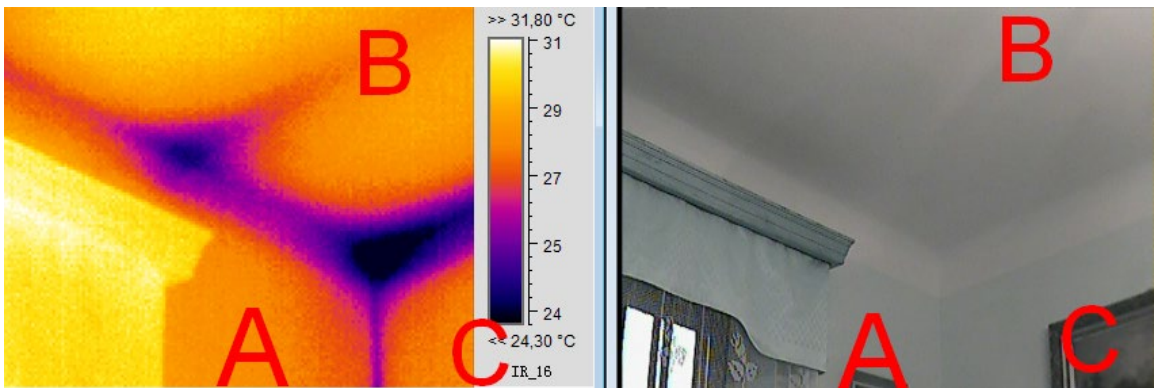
Place of joint wall with insulation from inside with ceiling and internal division (A – wall insulated from inside, B – ceiling without insulation, C – internal wall without insulation), K. Janus
